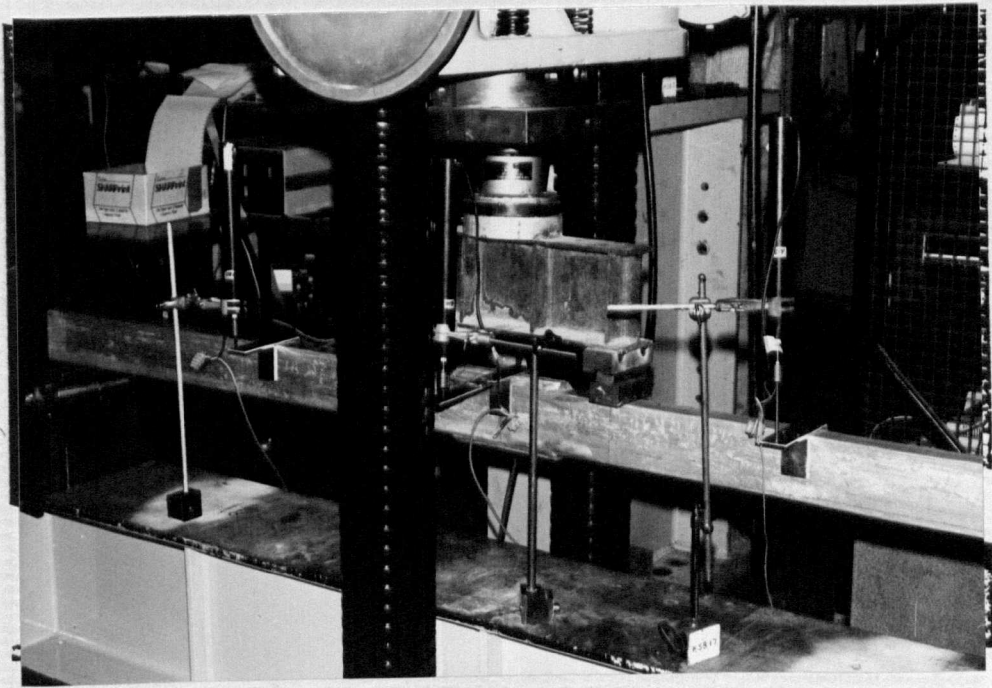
Set-up of Beam Test with 1000 *mm* Span
